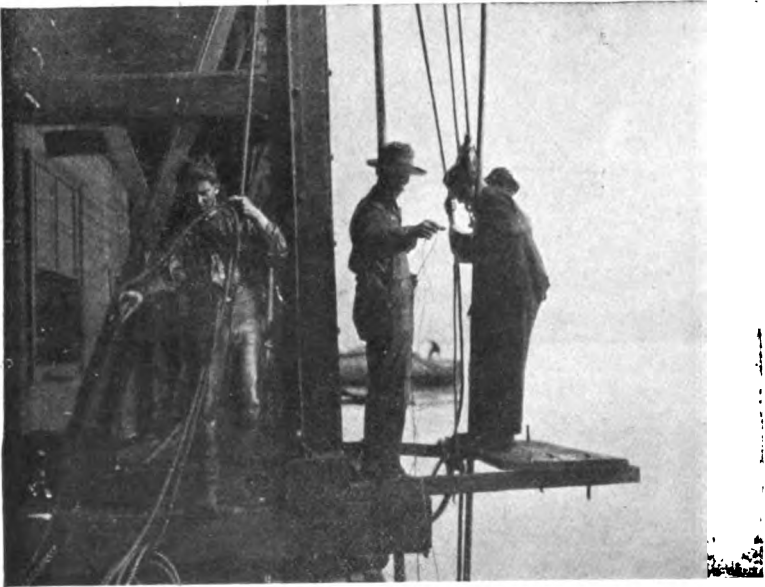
Changing Steels on Drill Boat "Destroyer."
